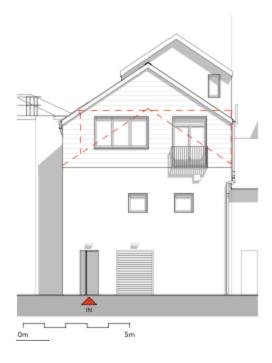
Proposed West Elevation showing roof line to be demolished as broken redlines and LB eaves to left. -drawing no. 023-36 320-01
